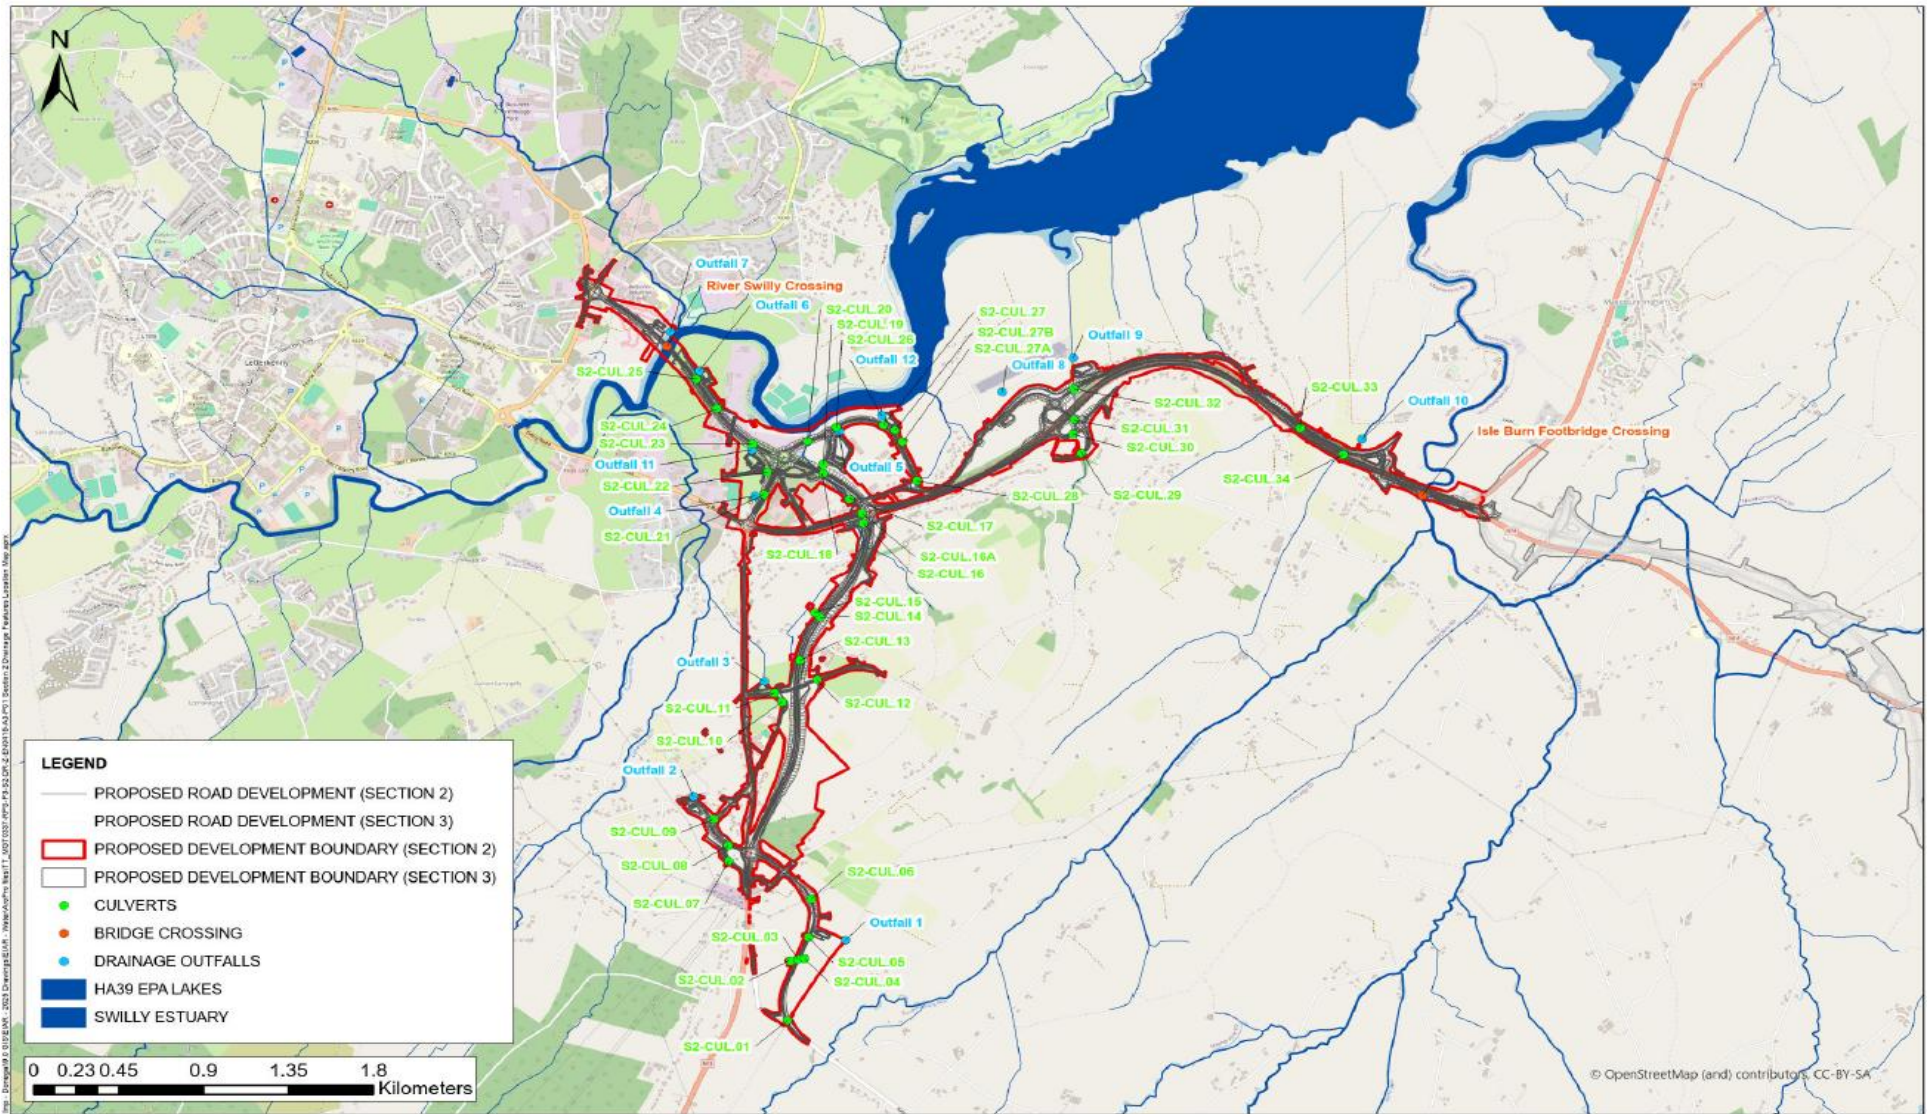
Section 2 Locations of Culverts, Bridges and Proposed Stormwater Outfalls
